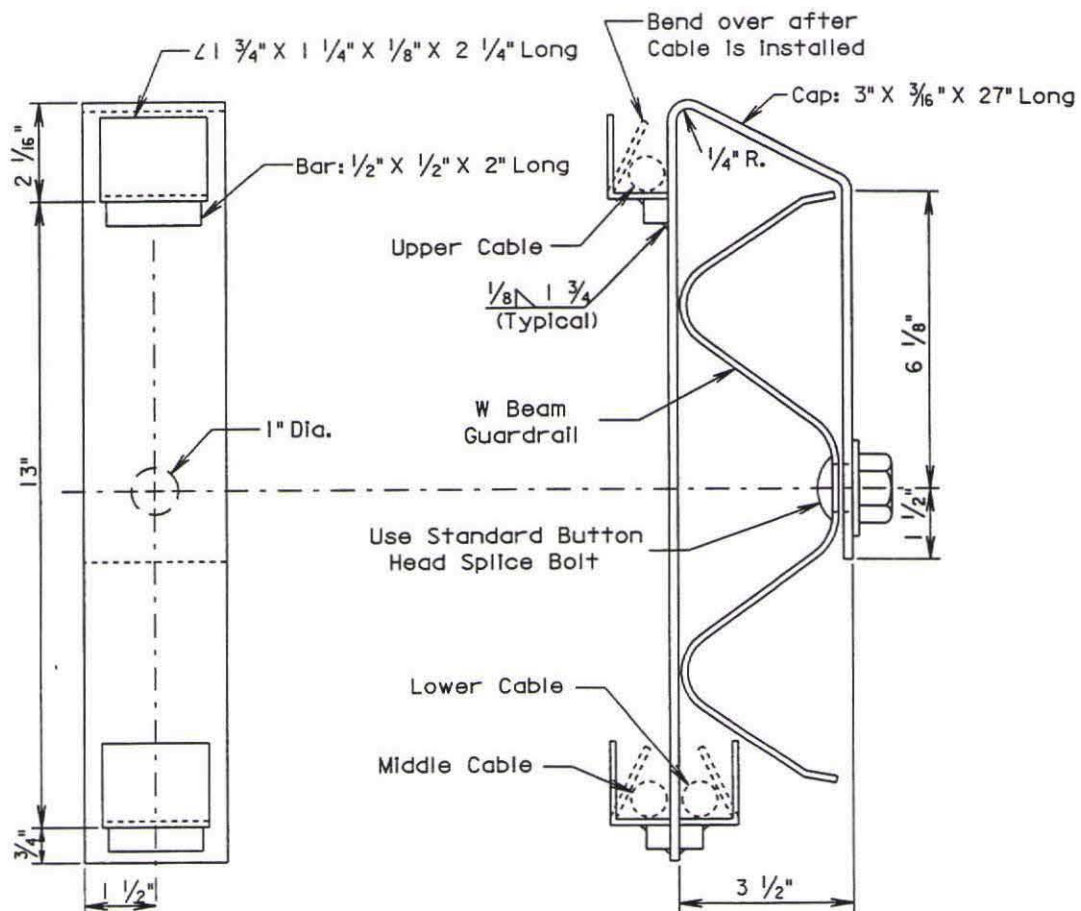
Cable Guardrail to W-Beam Transition Design Details (Continued)
